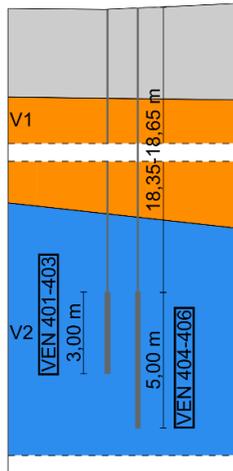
Part of the cross-section of the soil profile including the single-rod grouted anchors in Venhaus
